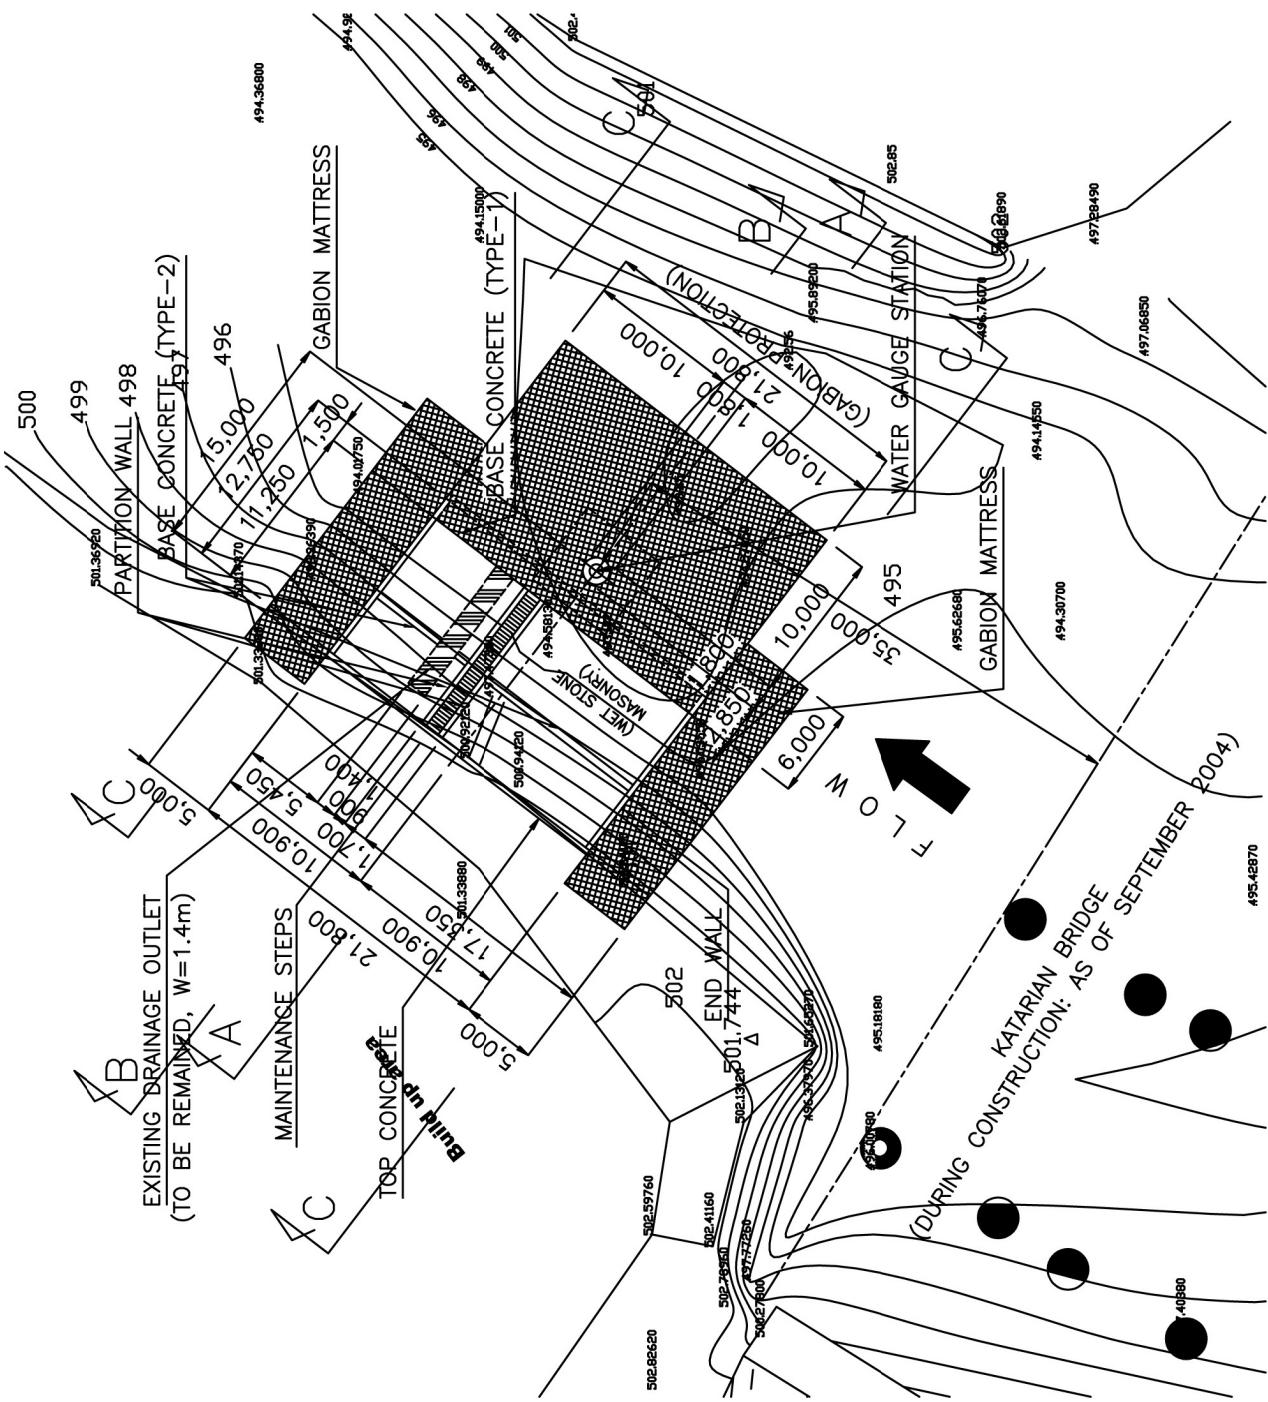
Layout Plan of Water-level Gauging Station (Kataran Bridge)
